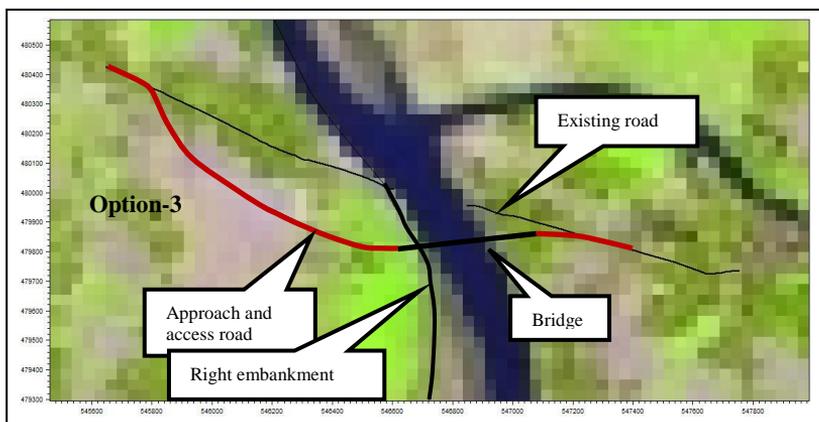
Proposed alignment of the bridge and approach road over Lohalia river at Boga ferry terminal
